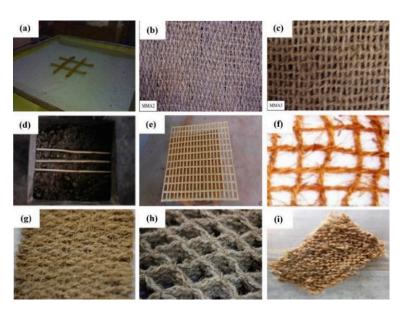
Various kinds of natural geotextile. (a) Coir rope reinforcement [39], (b) Woven coir geotextiles 38], (c) Woven coir geotextiles [38], (d) Bambo reinforcement [25], (e) Bamboo grid [35], (f) Coir geotette [28], (g) Coir geotextile [34], (h) Coir geocell [34], (i) knaf fibre geotextile [15].
